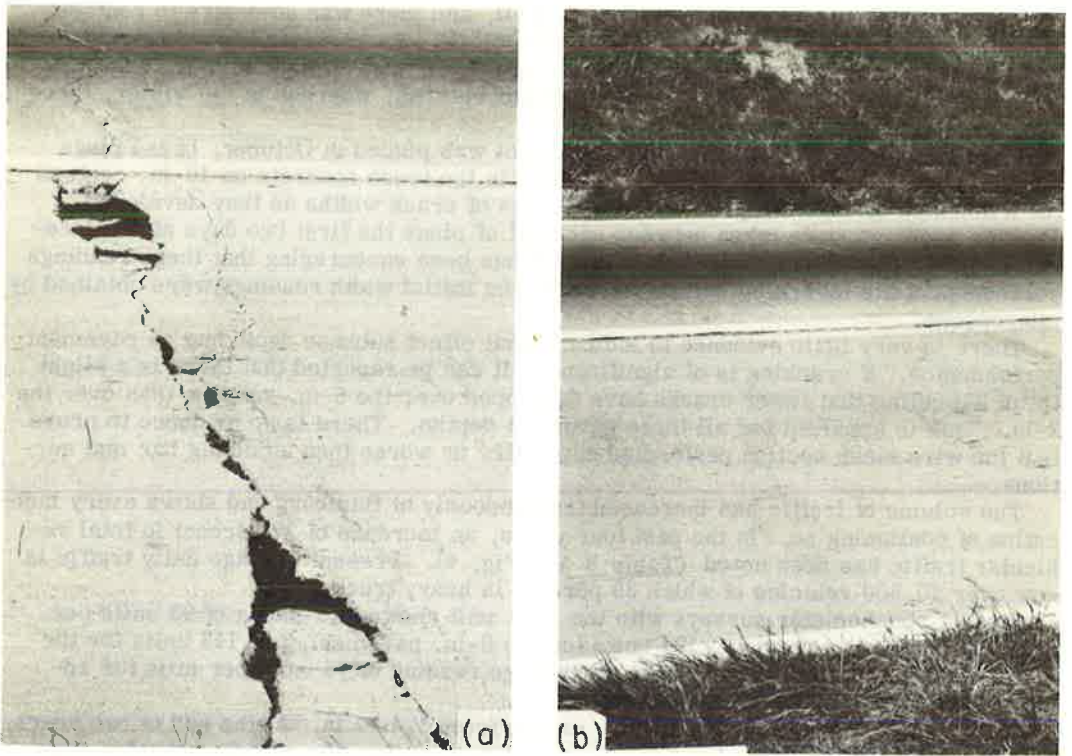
Hamburg pavement: (a) appearance of typical wide crack, (b) patched area after 4 year's service.
